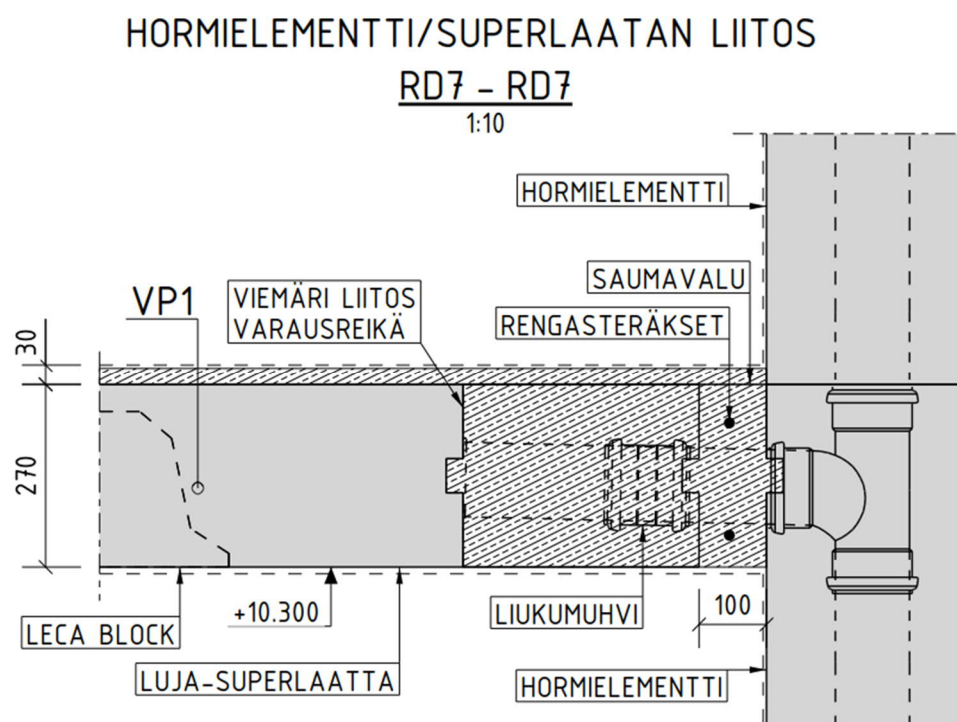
Hormielementti connection (Tekla Structures drawing snapshot)
